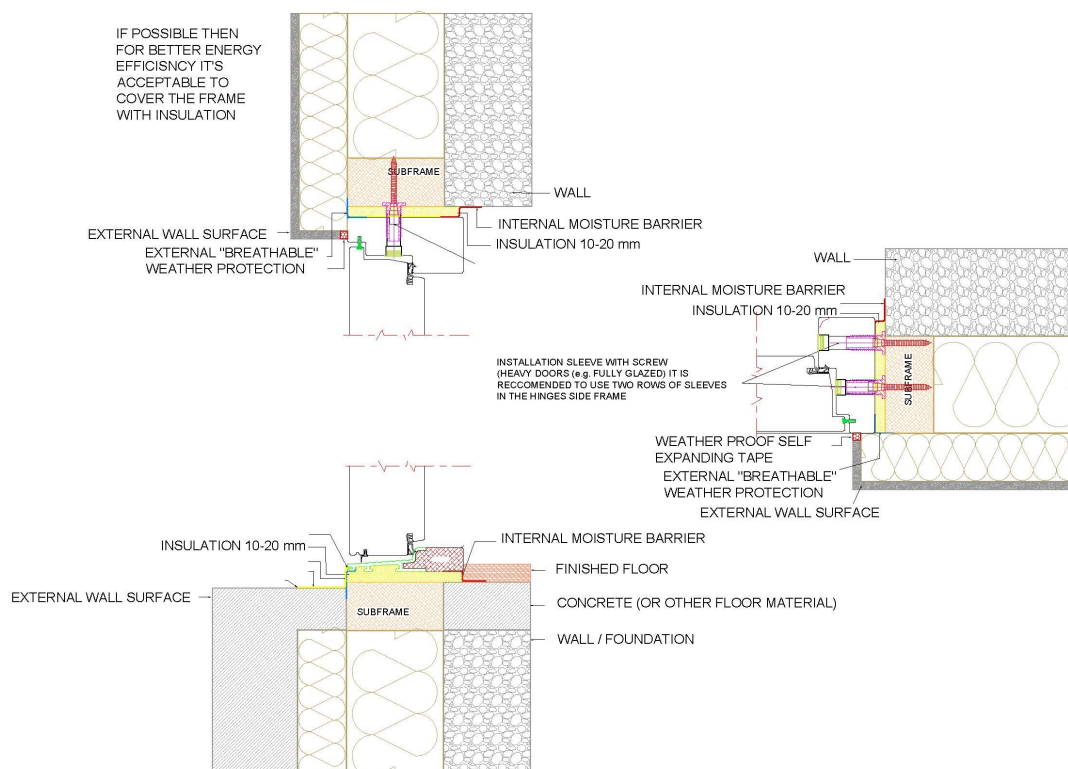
The installation schemes of external door set (by way of example of SW17 panel door)
